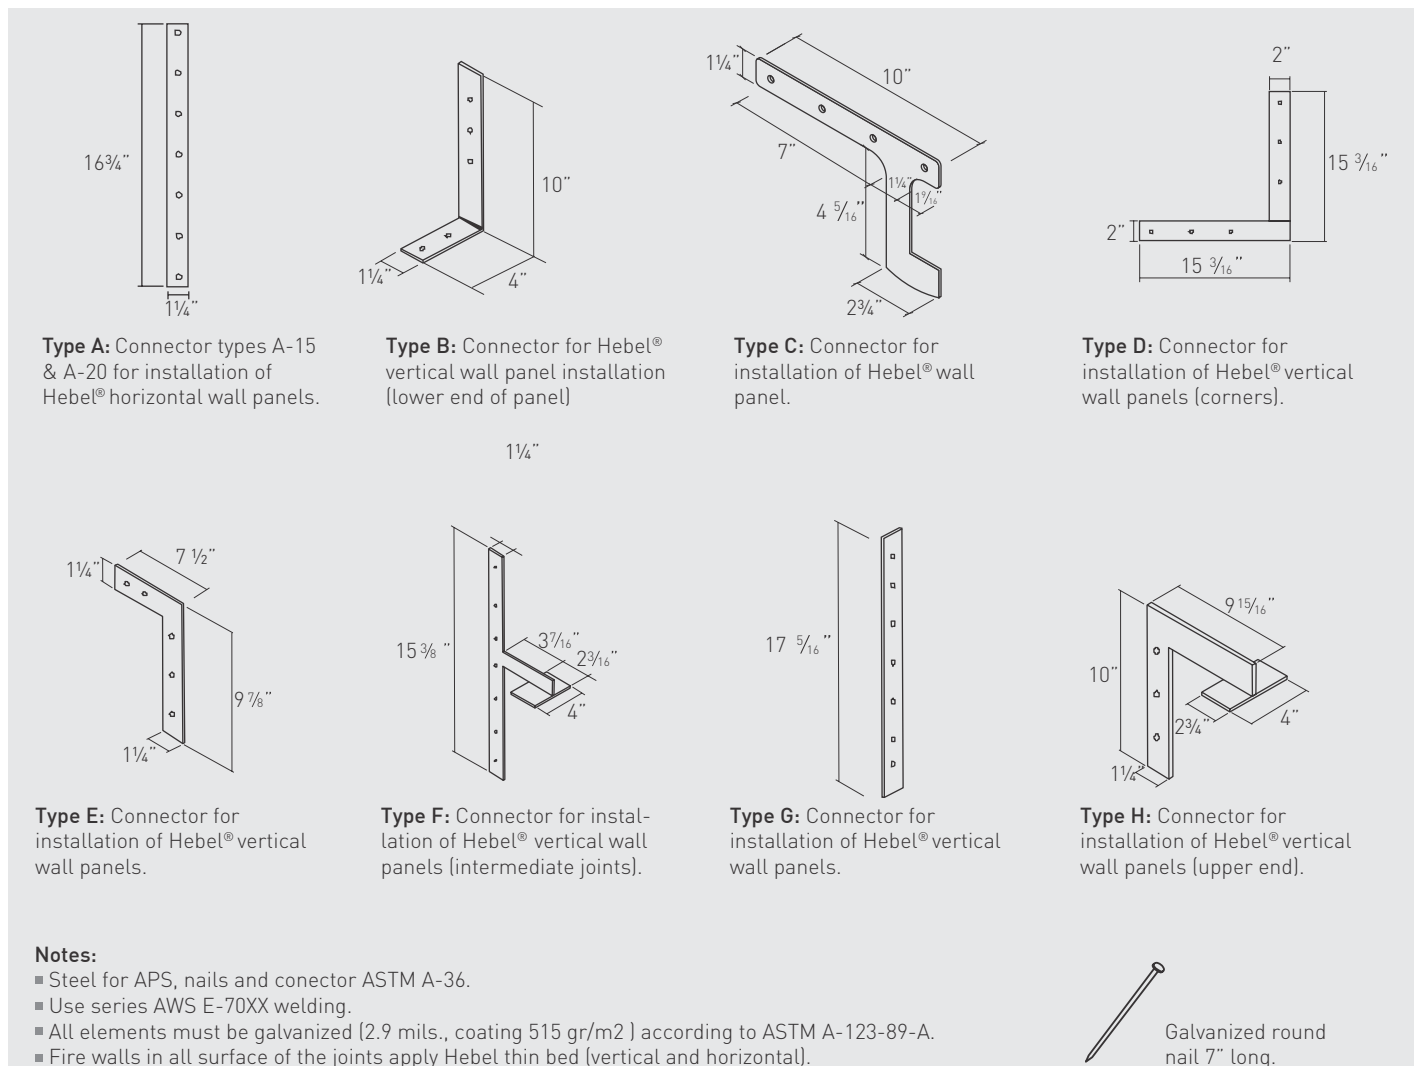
Summary of connectors for Hebel® Wall Panel installation.
